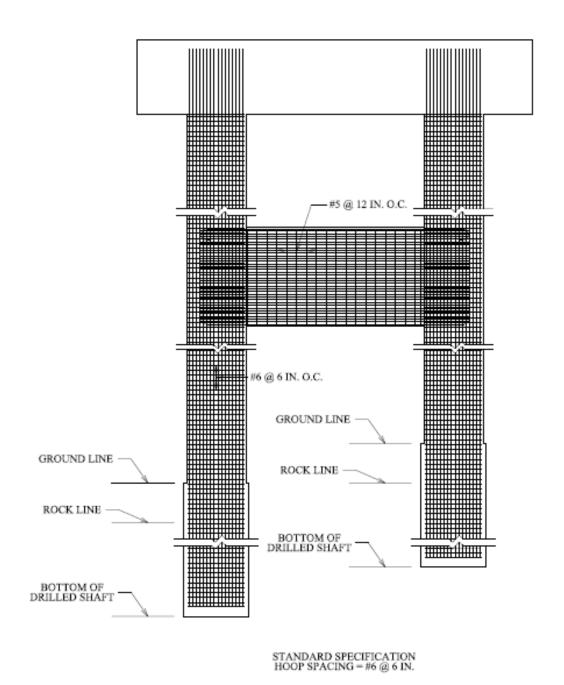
Scarham Creek Bridge Bent 3 Standard Specification
